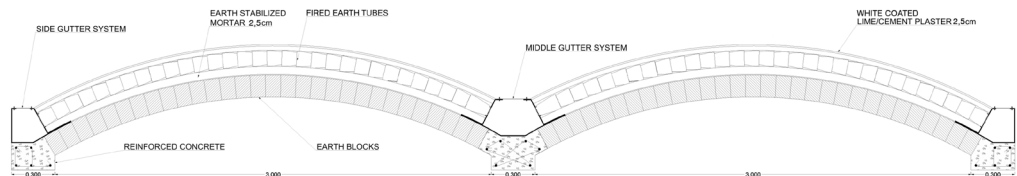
Enhanced vault roof system with fired earth tubes air gap. (adapted from Arzjani & Baghirova, 2023).
